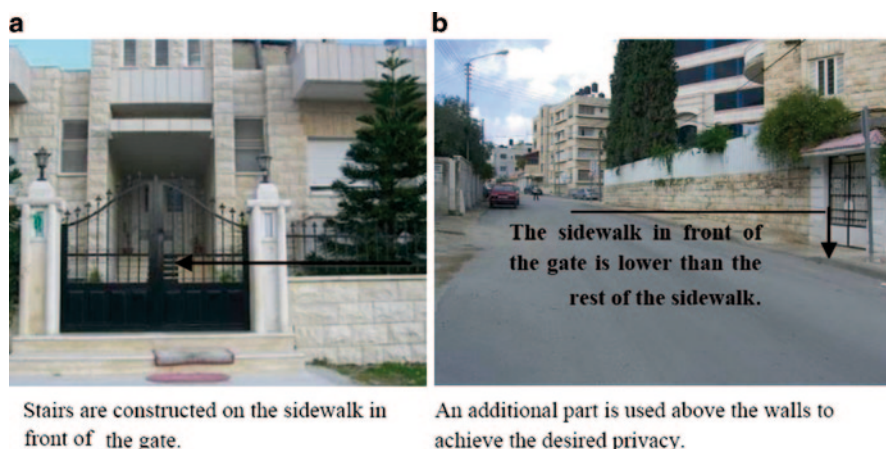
Examples of women's privacy and inhabitants' attitudes toward residential gardens. a Stairs are constructed on the sidewalk in front of the gate. b An additional part is used above the walls to achieve the desired privacy
